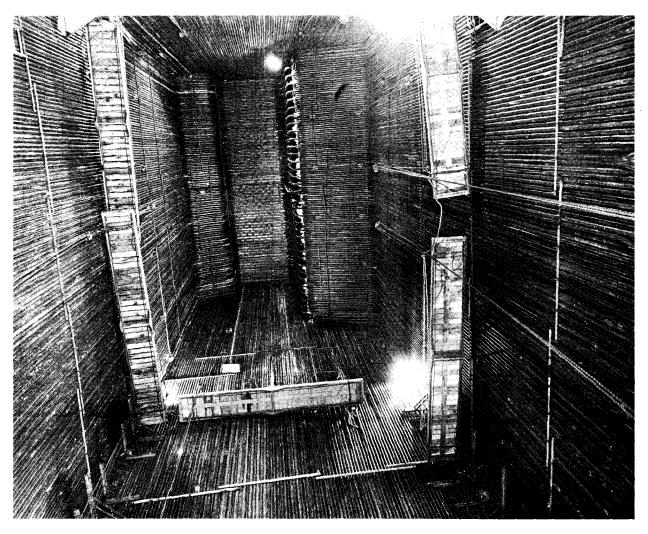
Inside unit 1 boiler looking up from ash hopper showing tubing for furnace water walls, superheater and reheater elements.
